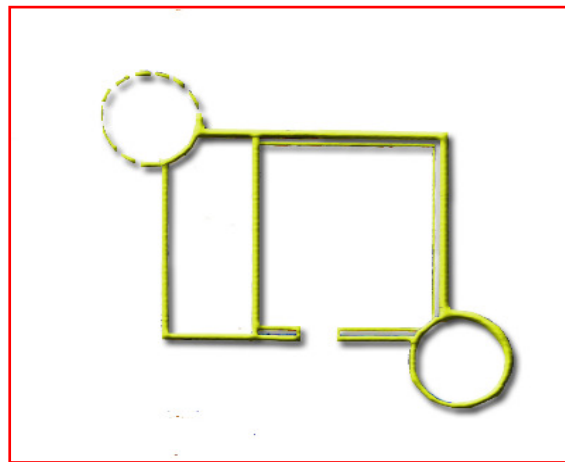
An outline plan of Salterstown: Salters' Company plantation castle (adapted from Kerrigan 1995).
